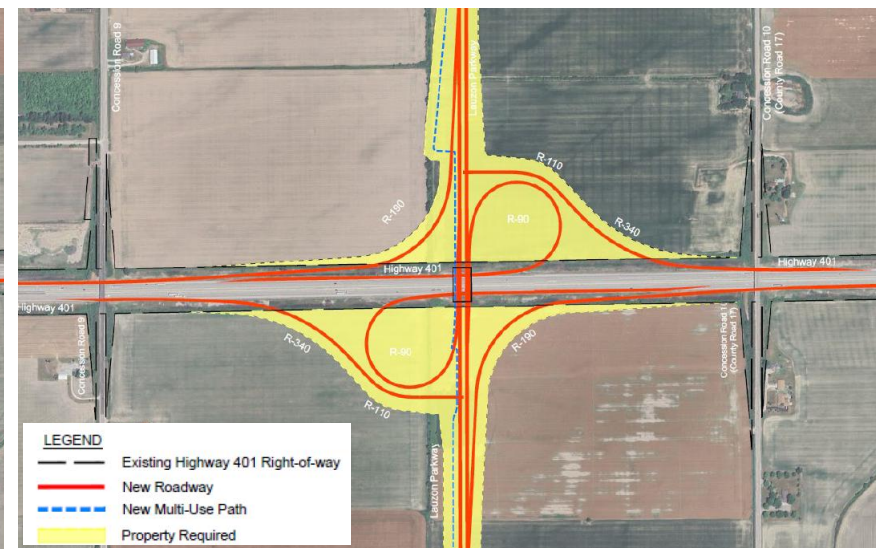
Alternative 2 - MUP Incorporated into Ramps and New Lauzon Parkway Bridge
